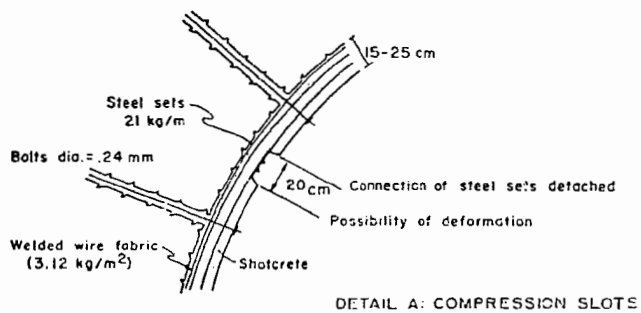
Design of tunnels in swelling rock; passive approach.
